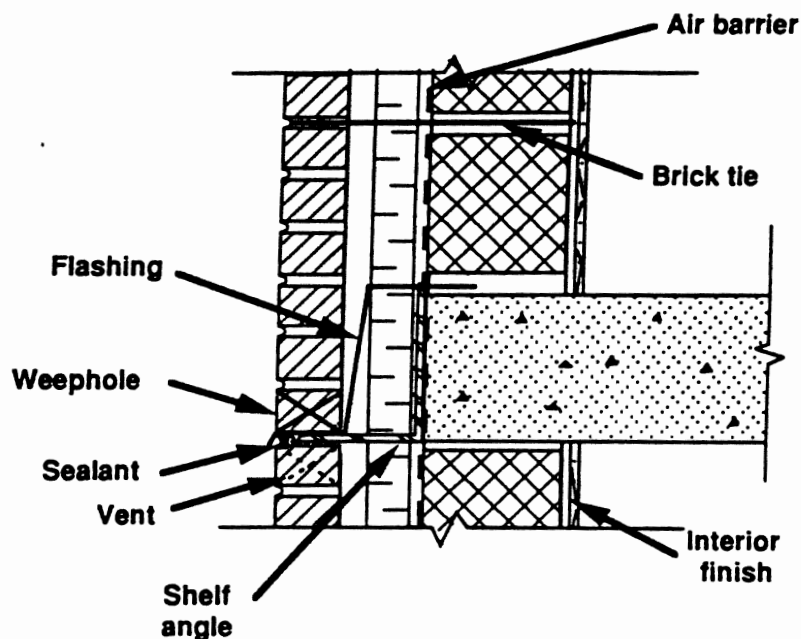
Brick Veneer Wall (CMHC 1989)
